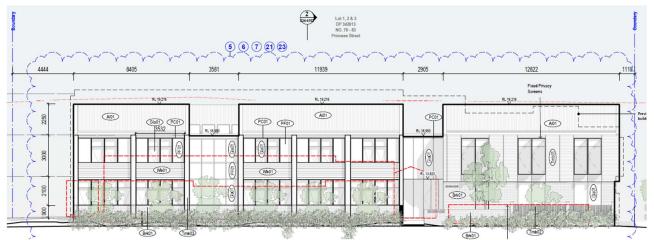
Detailed elevations of the accommodation building (H&E Architects, 2024)
